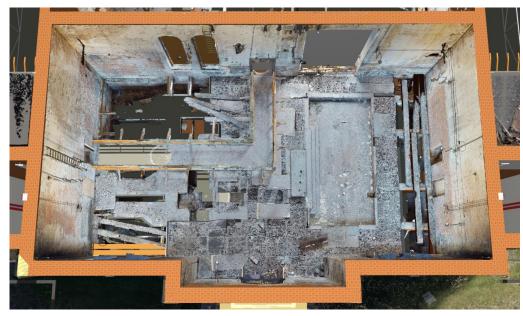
Existing CHEH Engine Room, birds-eye view with roof removed, 3D Architectural Model /Point-Cloud scan. The floor of the Engine Room is non-trafficable given the corroded structure below, inaccessible given the asbestos hazard and has large openings through to the subfloor.
